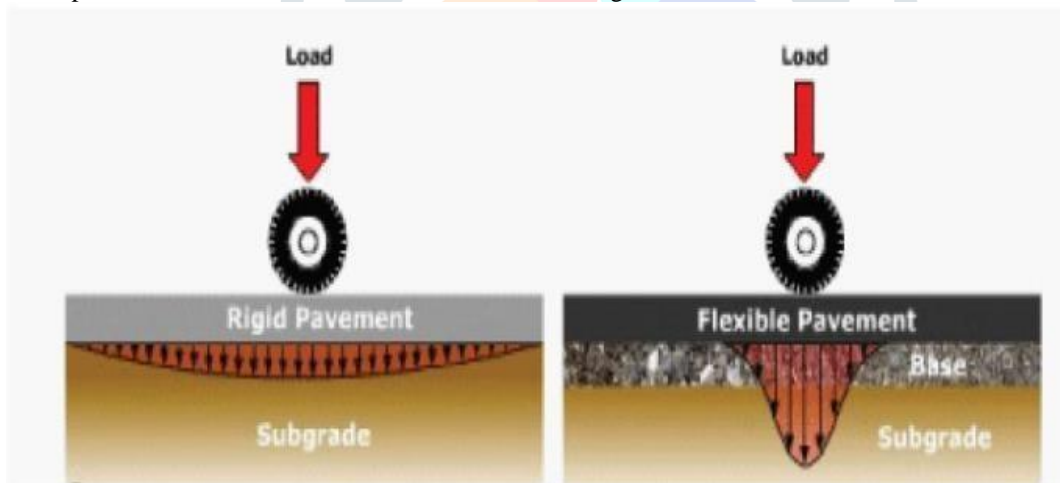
Typical stress distribution under rigid and flexible pavement (TxDOT 10/2006)
